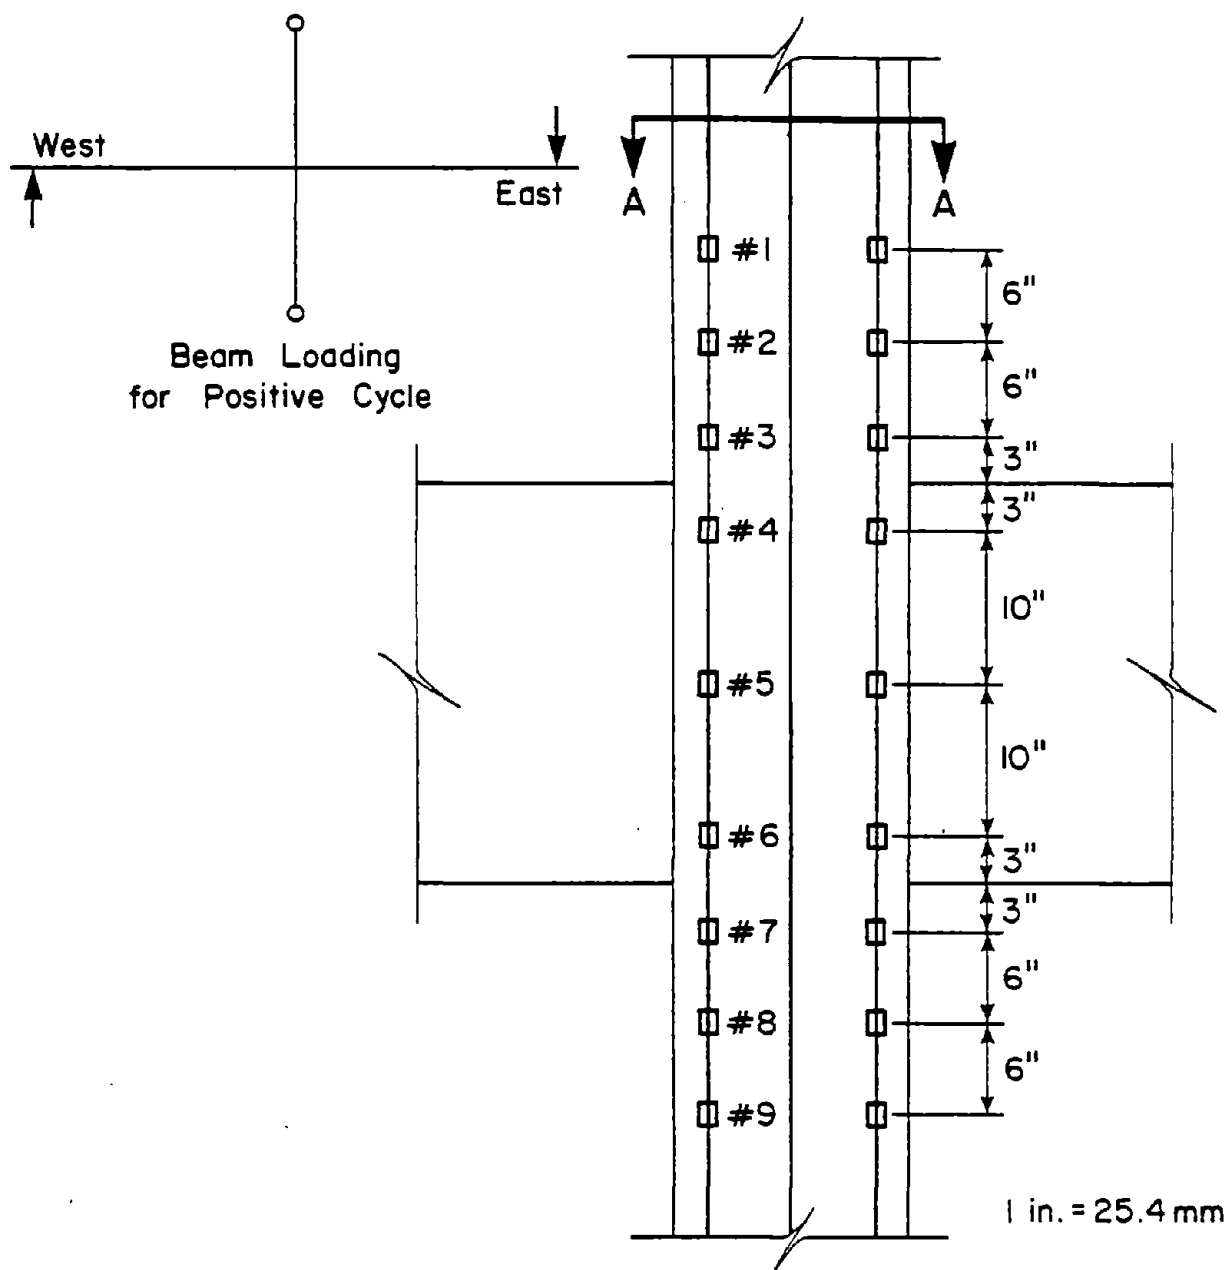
Locations of Strain Gages on Instrumented Column Steel
